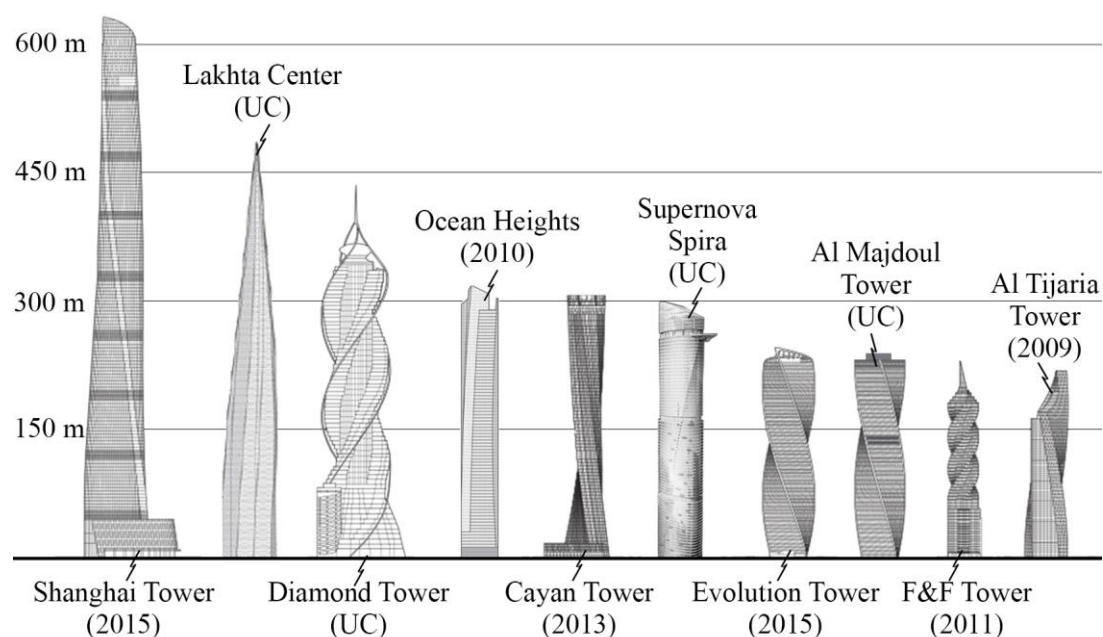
Tallest 10 twisting buildings in the world (Adapted from the Skyscraper Center, 2019b)
